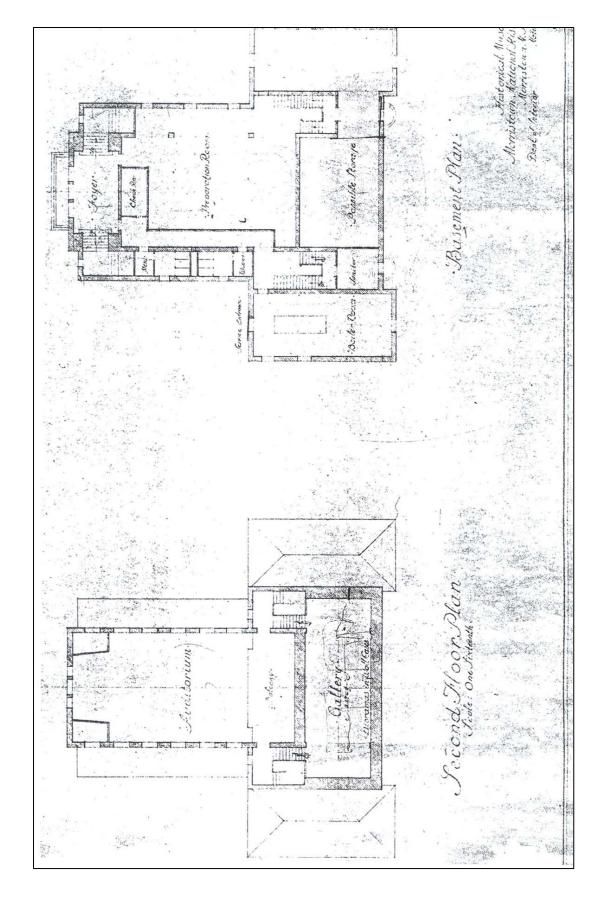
"Historical Museum," second- floor plan and basement plan (1934).
